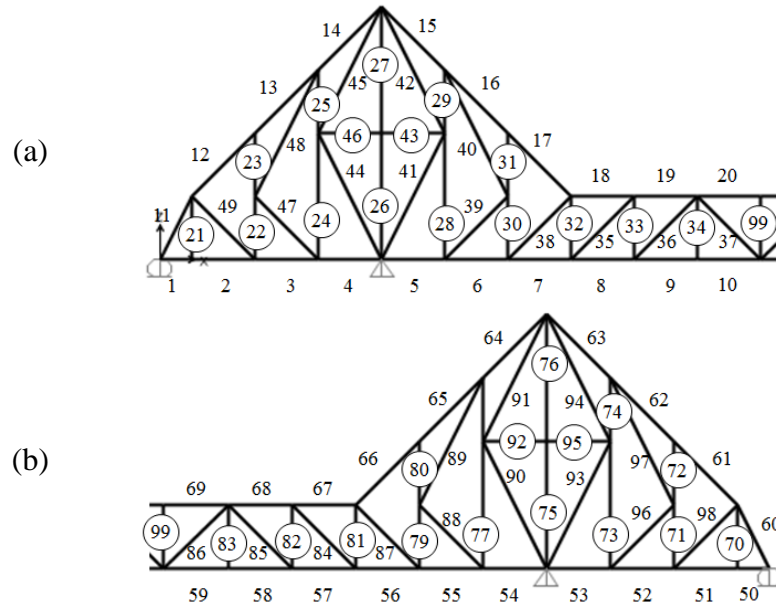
Element numbering for the examined truss plane of the QUT through-truss bridge model. (a) Left half of the examined truss plane; (b) Right half of the examined truss plane
